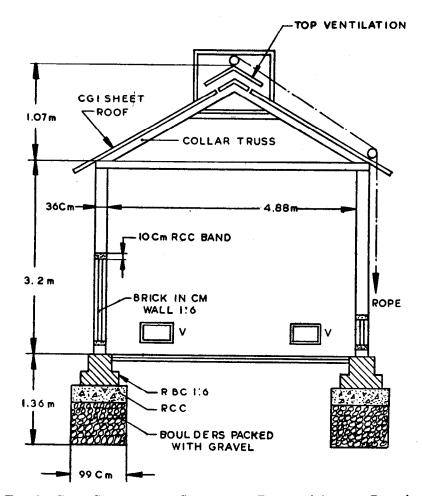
Cross Section with Structural Details (Andhra Barn)
